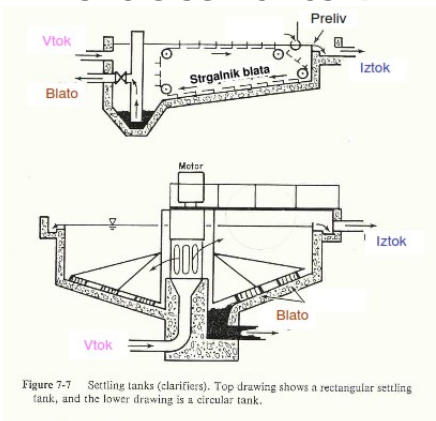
Settling tanks (clarifiers). Top drawing shows a rectangular settling tank, and the lower drawing is a circular tank.
